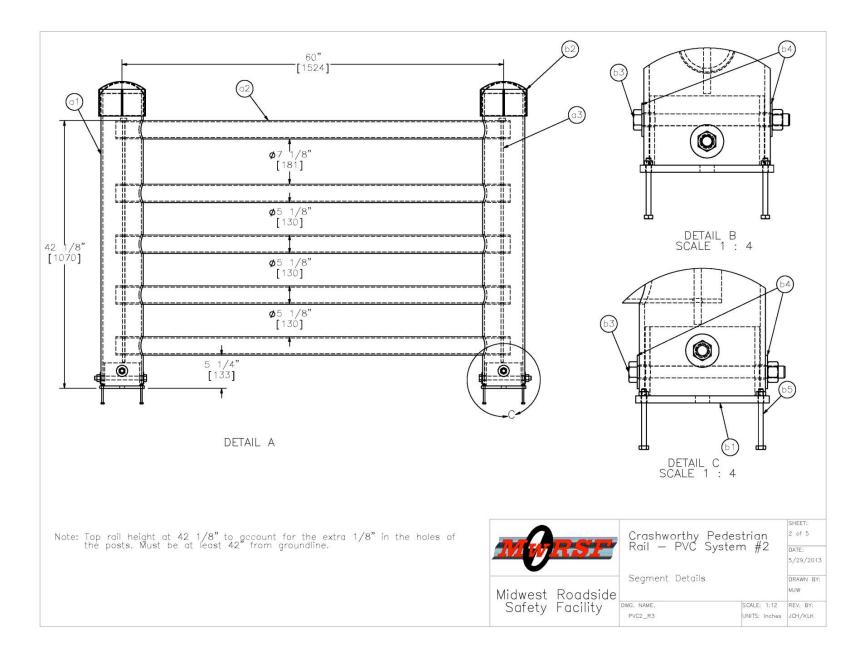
Modular PVC Rail, Design Concept PVC2-a
